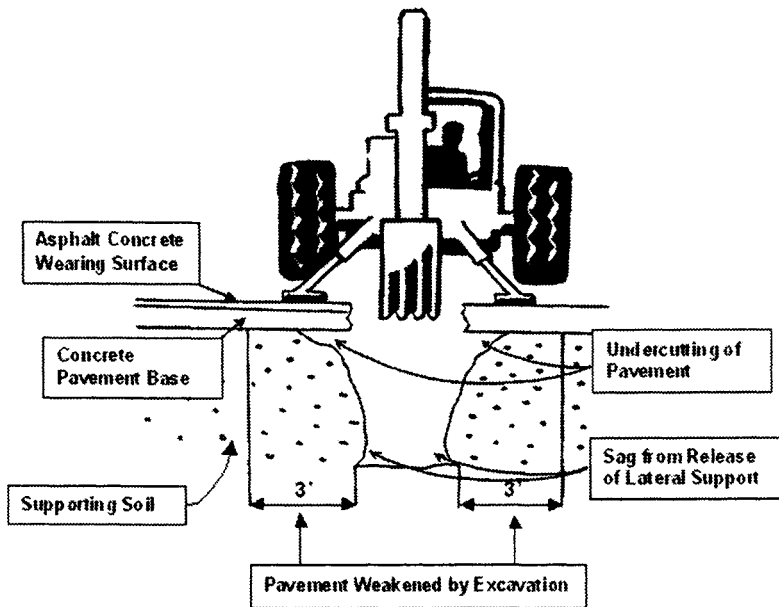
Pavement Surface and Soil Disruption from Excavation.
